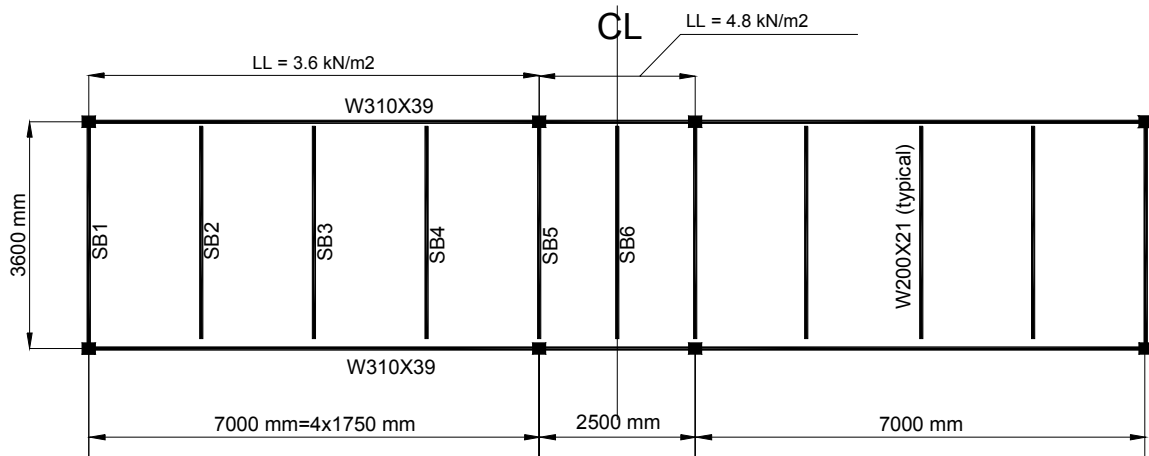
Layout of Modular Floor Framing adopted for FE Model
